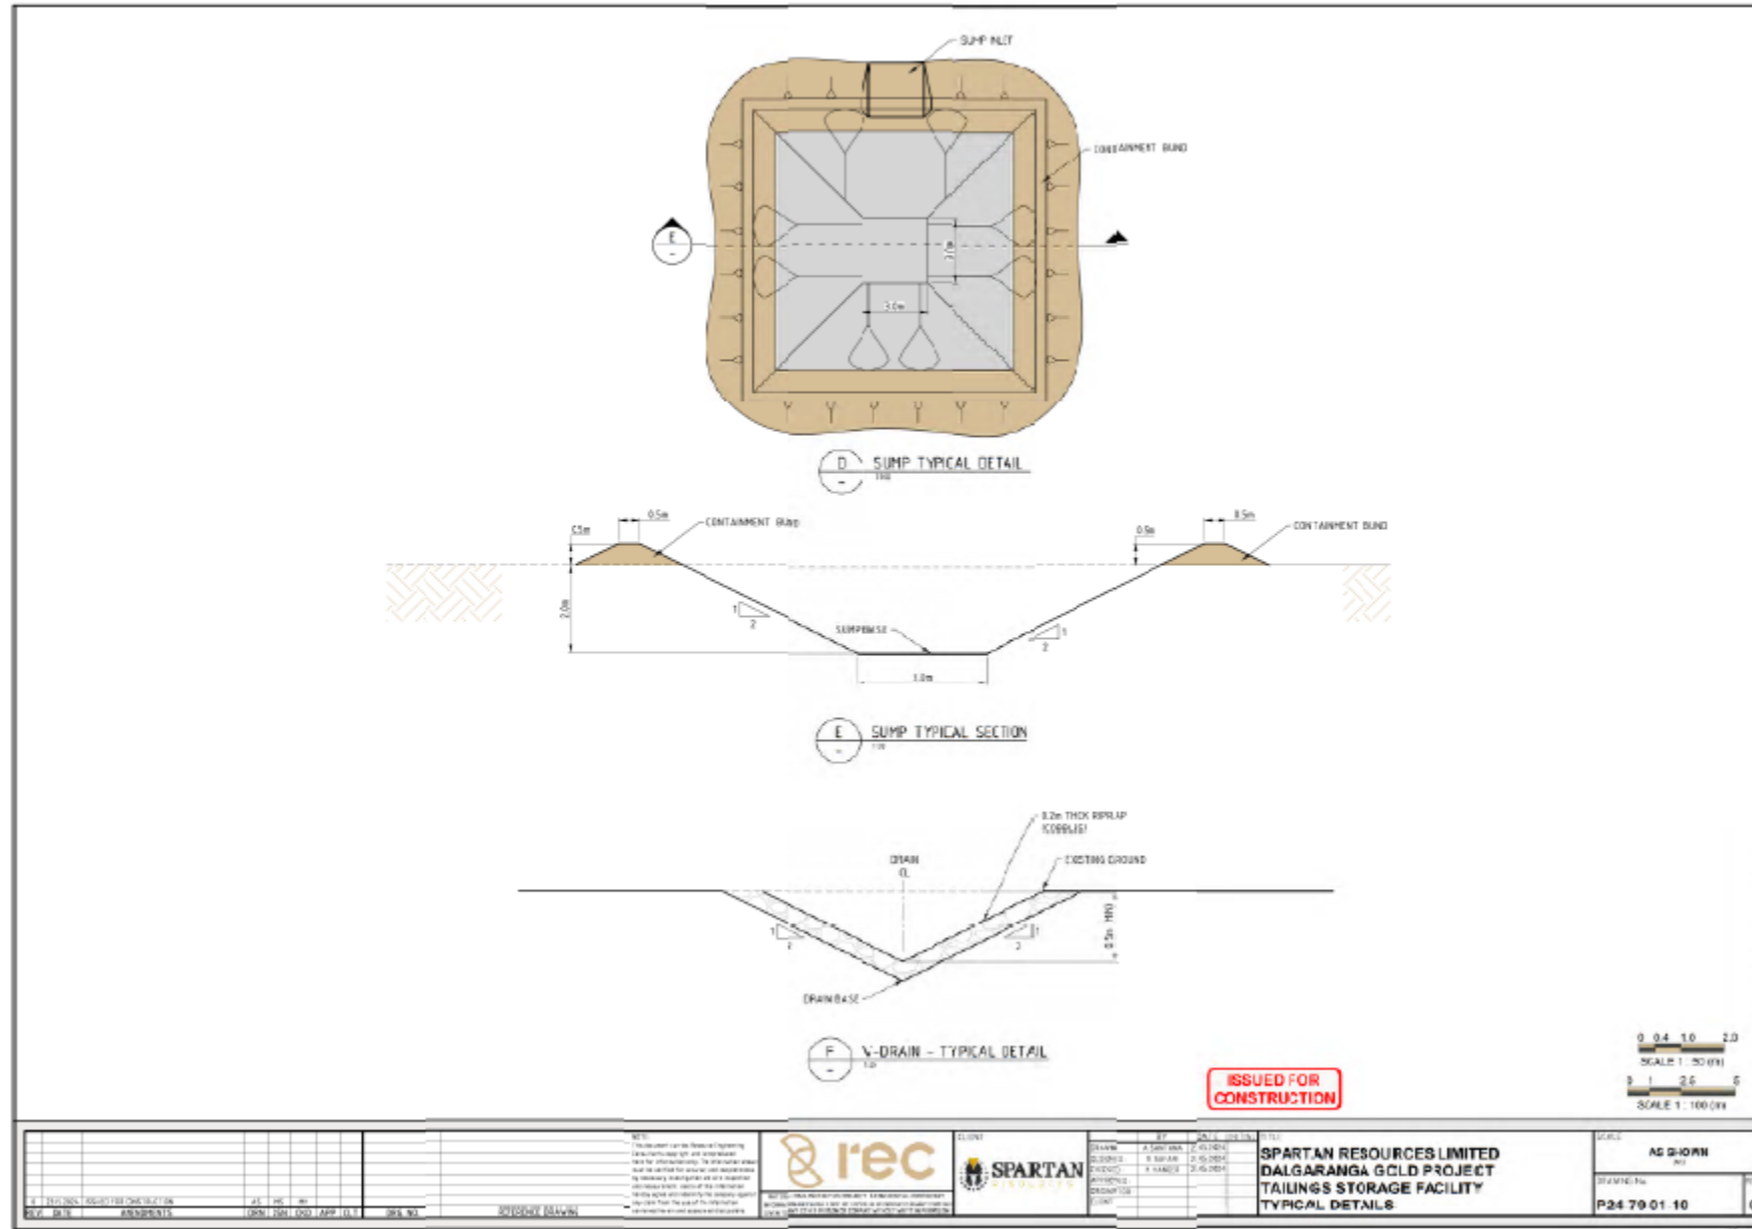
Gilbeys TSF reclaim cell design – v drain and sump design
